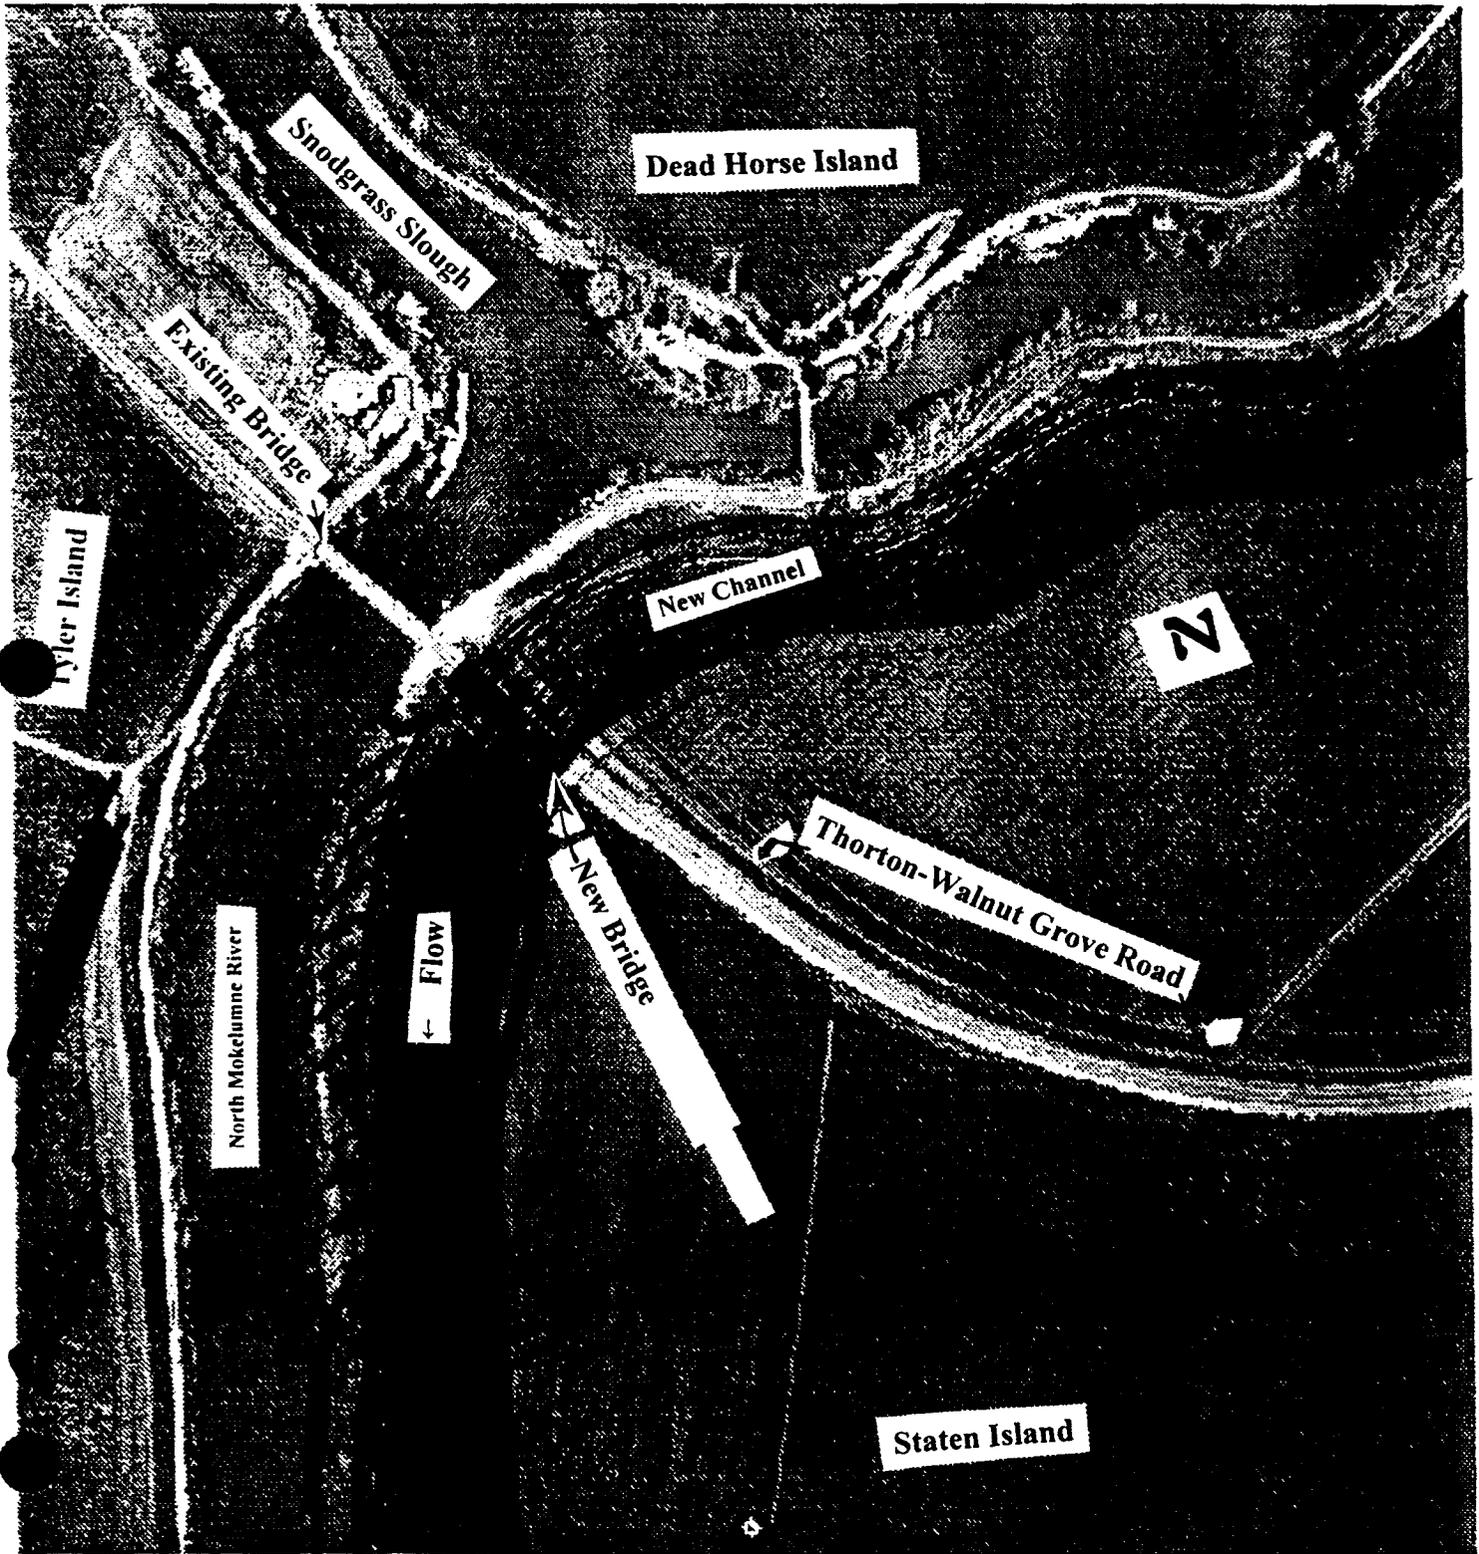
New Two-Lane Bridge on Thornton-Walnut Grove Road
